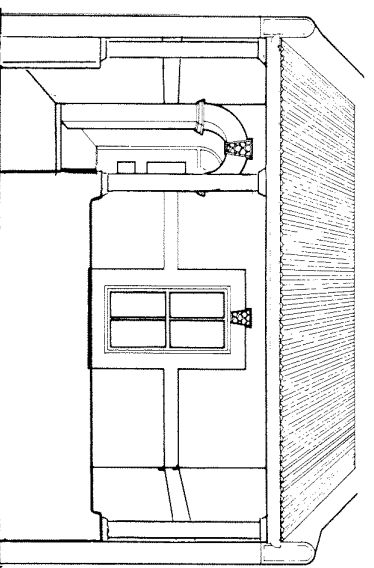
Retain plaster decoration and mouldings on facades and stoeps
